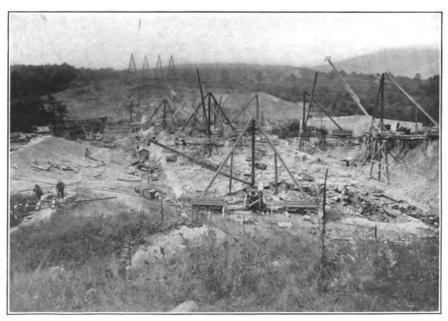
Fig. D.—Olive Bridge dam, showing arrangement of derricks.
